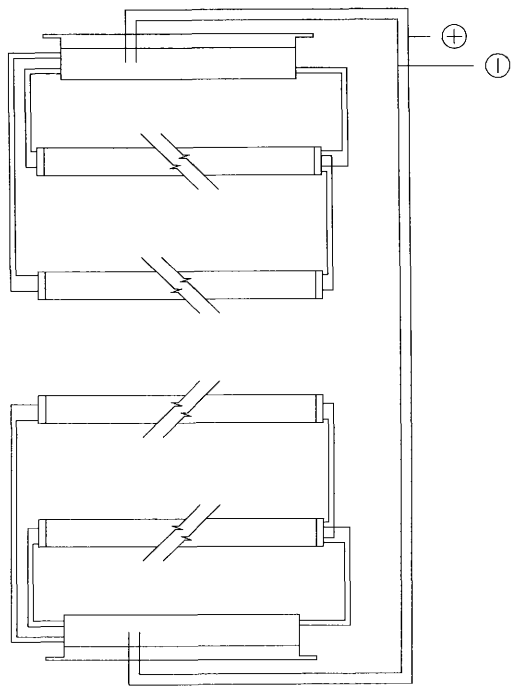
Wiring Diagram for Fixture Sockets, Ballasts, Electrical Cable.
